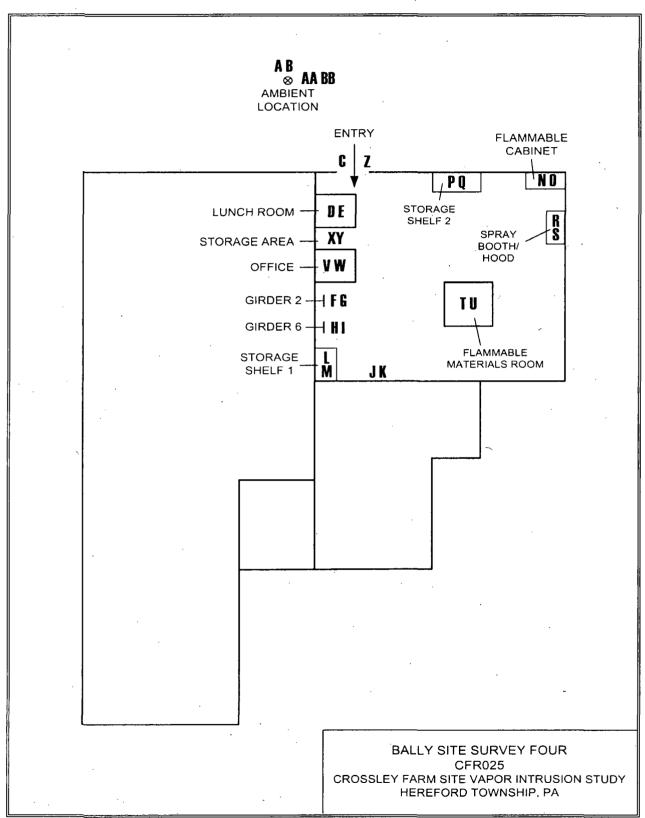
Bally Site Survey Four Floor Plan, CFR025
